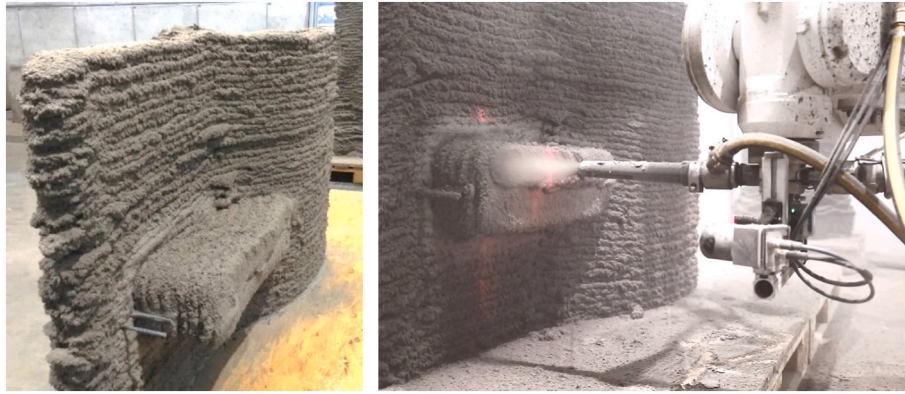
Subsequently, additively manufactured concrete bracket on a wall using SC3DP Add-On Printing (TU Braunschweig).
